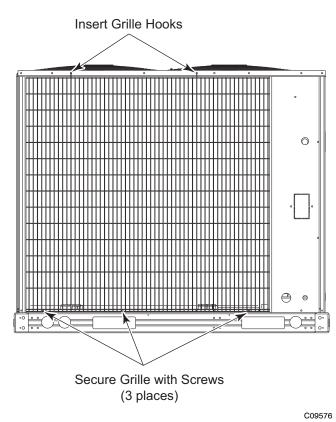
38AU with Outside Coil Grille - Left Side View
